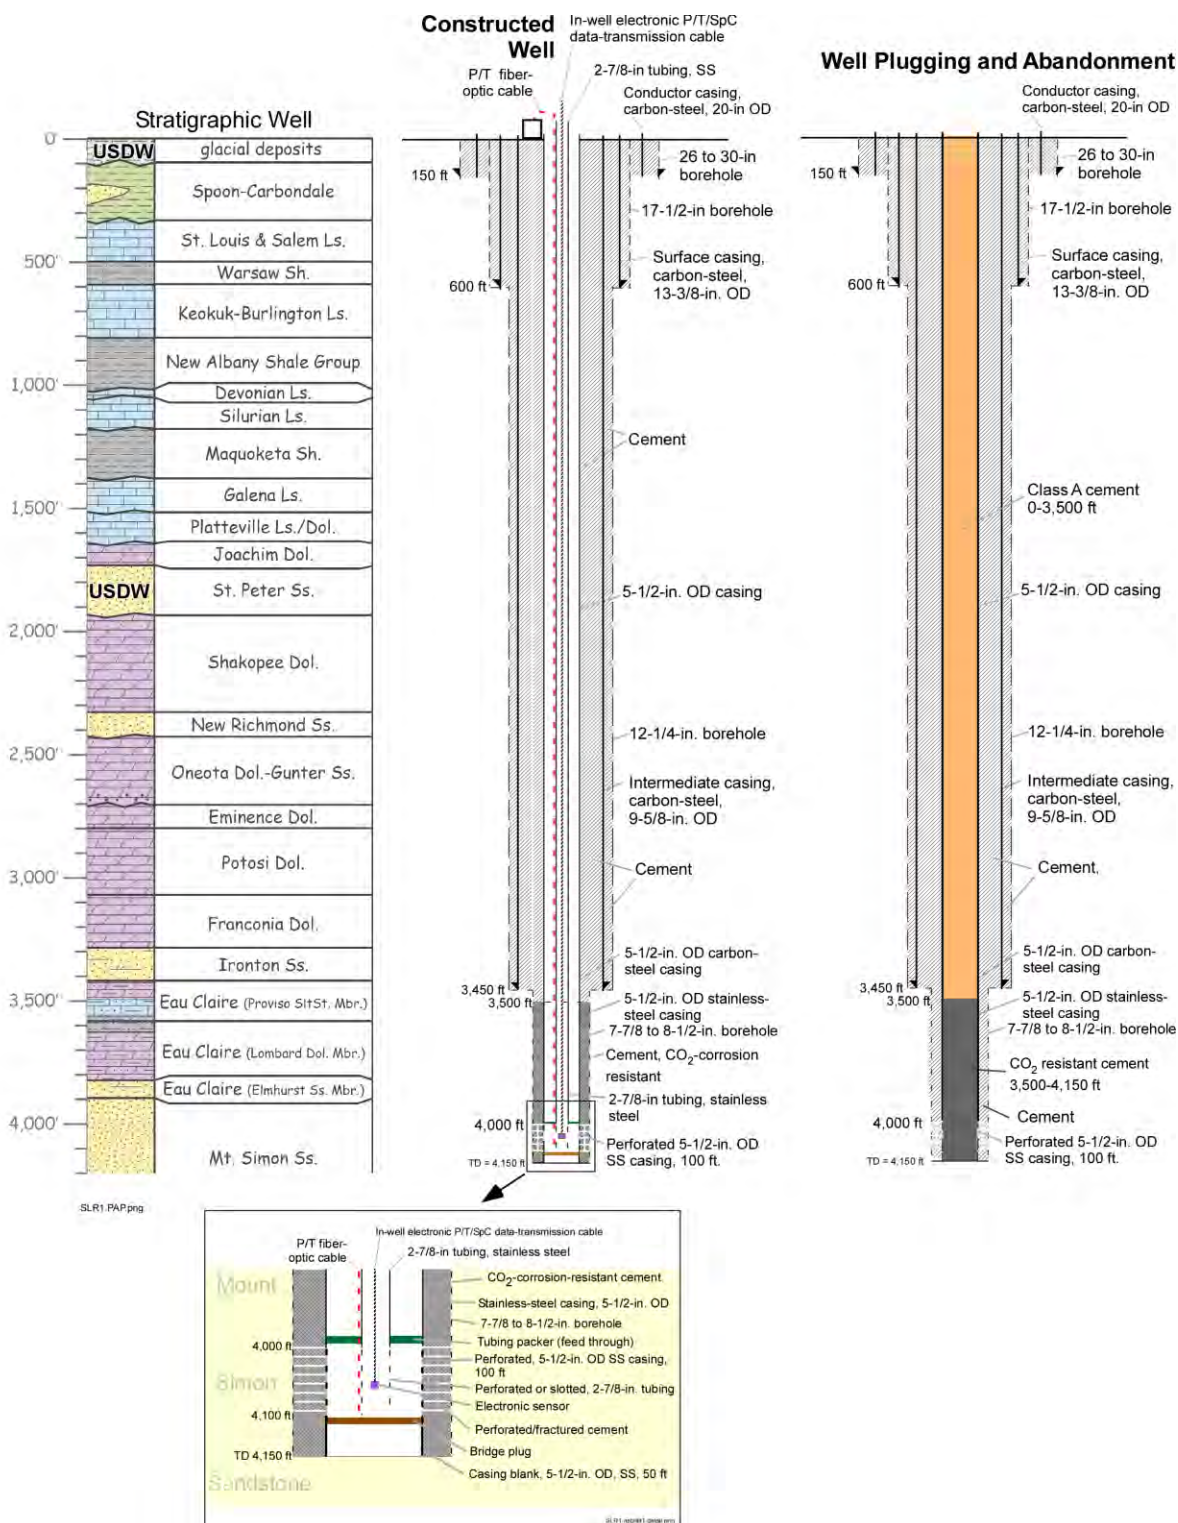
Construction design and plugging and abandonment plan for new 5.5-in.-diameter single-level in-reservoir monitoring well.
